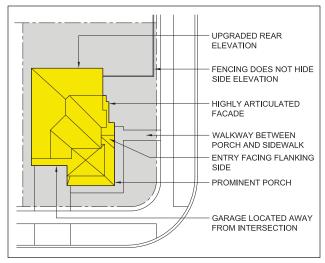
Conceptual plan view - corner lot dwelling.
